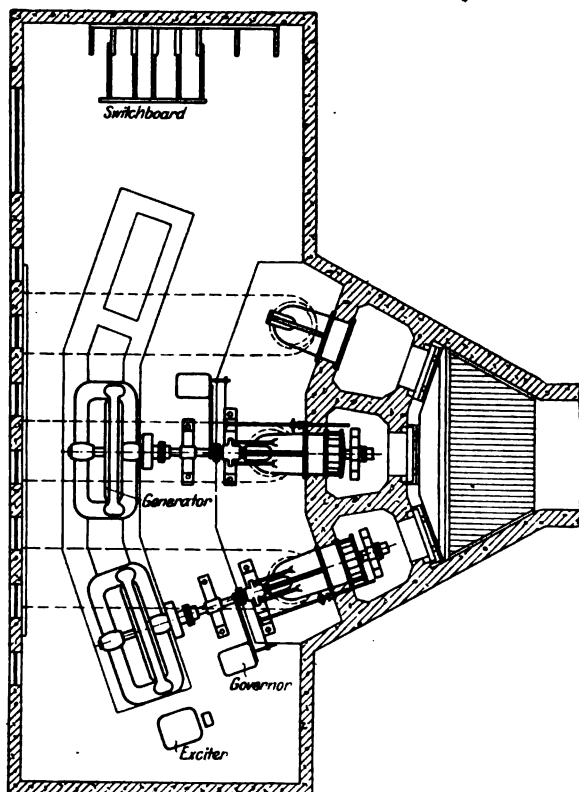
Plan of Power-House Bulkhead and Flume, Erindale Power Company.
